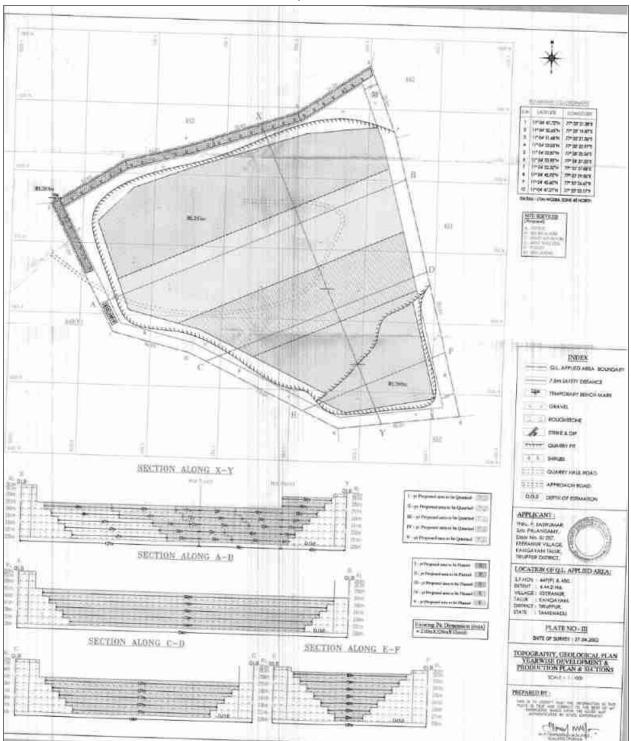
QUARRY LEASE PLAN / SURFACE PLAN-P2
